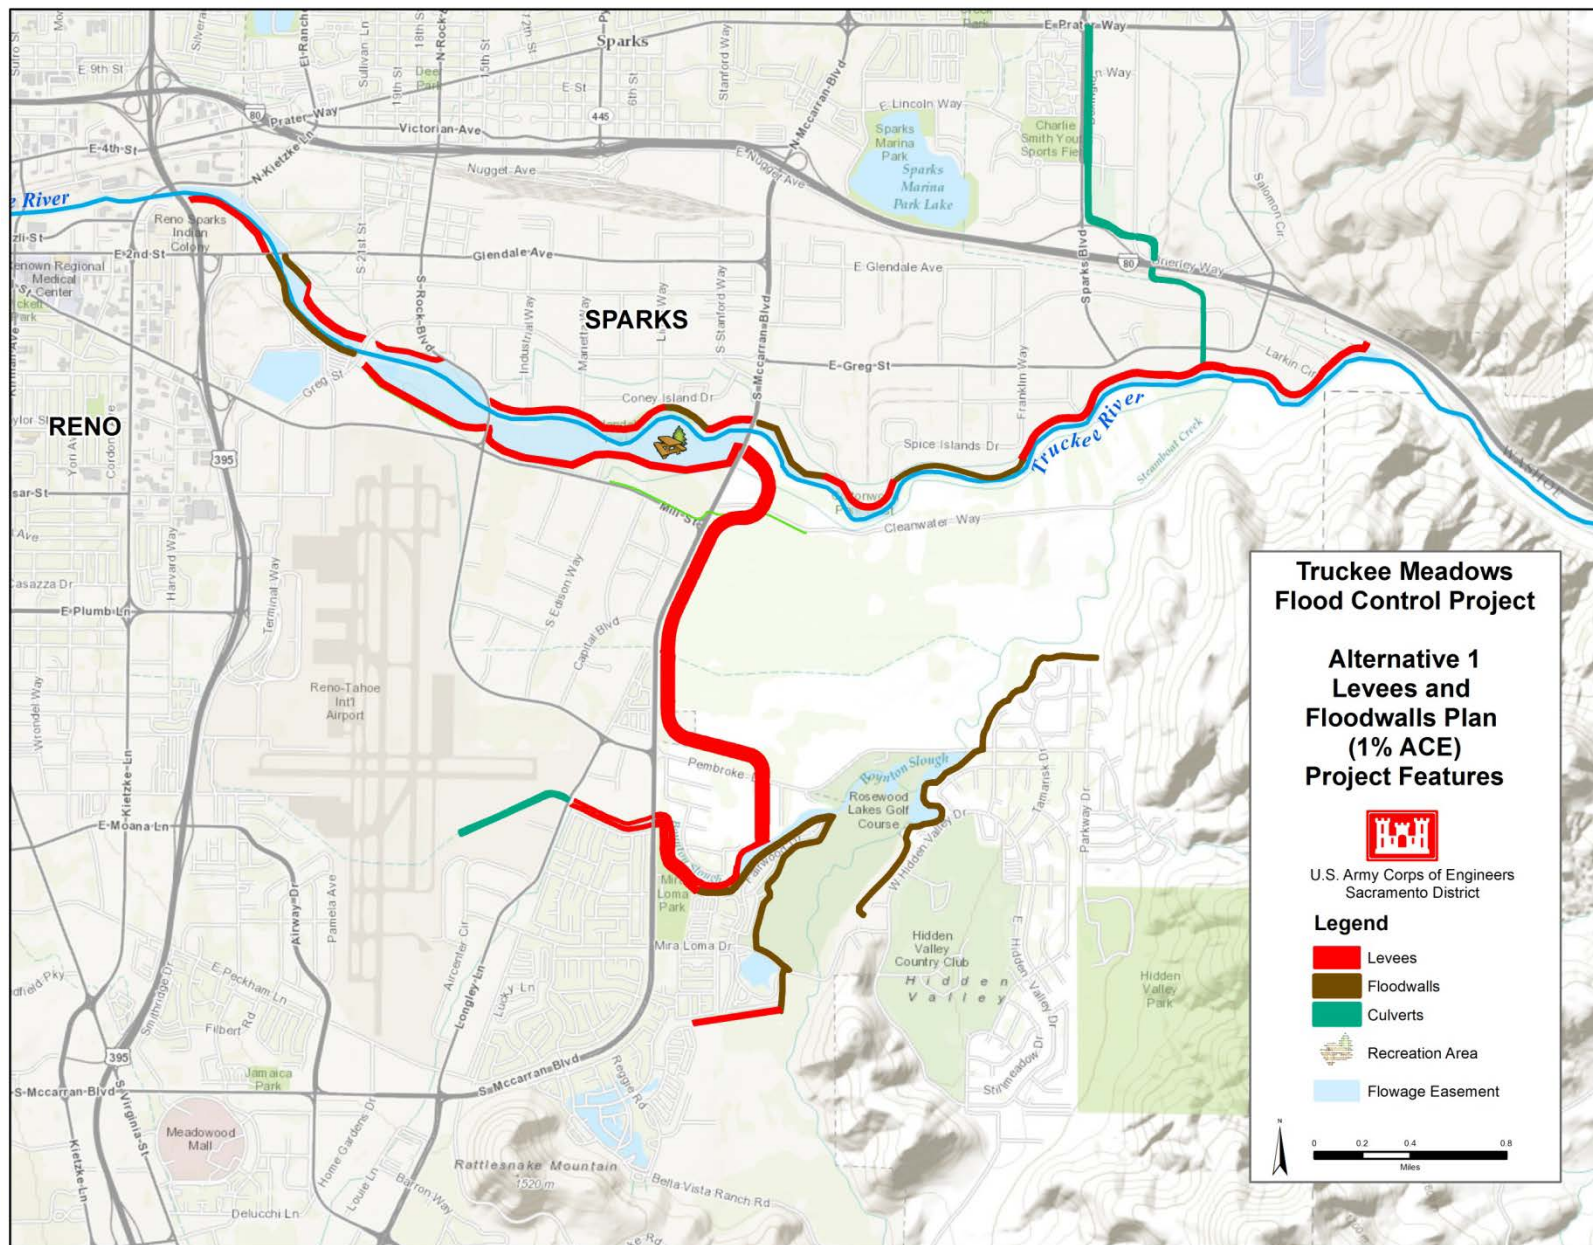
Alternative 1 - Levees and Floodwalls Plan
